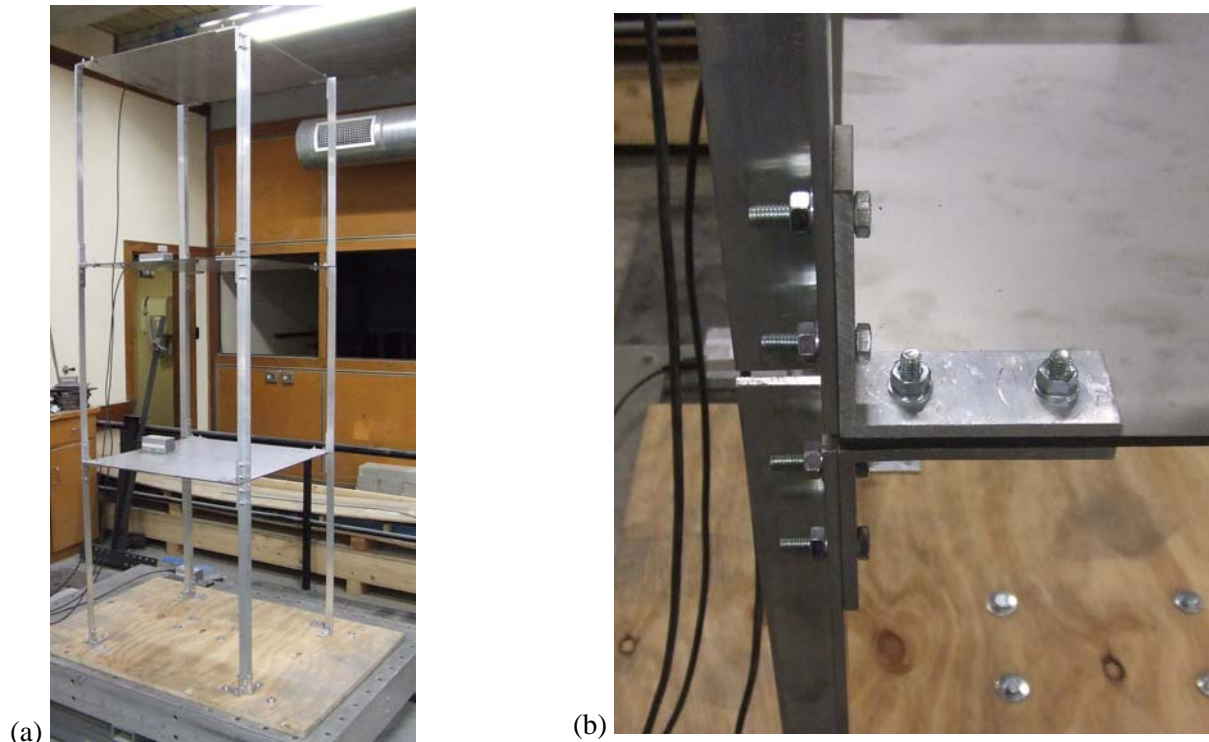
Photographs of the structure: (a) laboratory structure on shake-table, and (b) column-floor joint.
